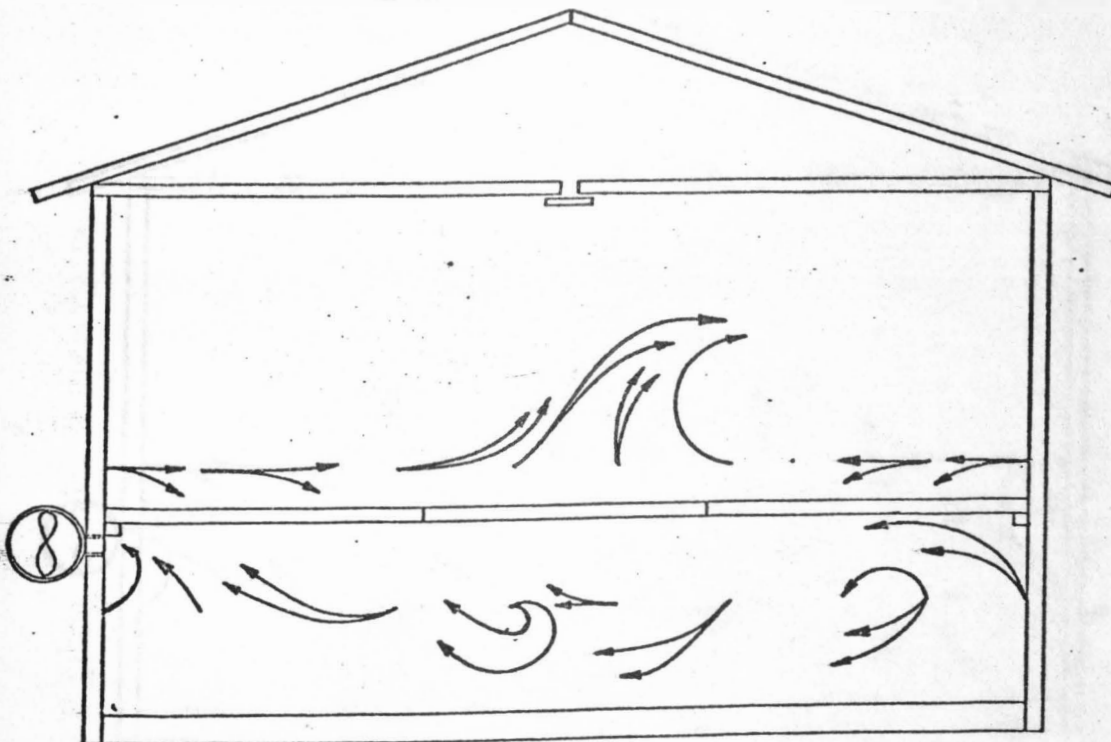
Air flow patterns for outside wall pit ventilator system, center baffle, center location.
